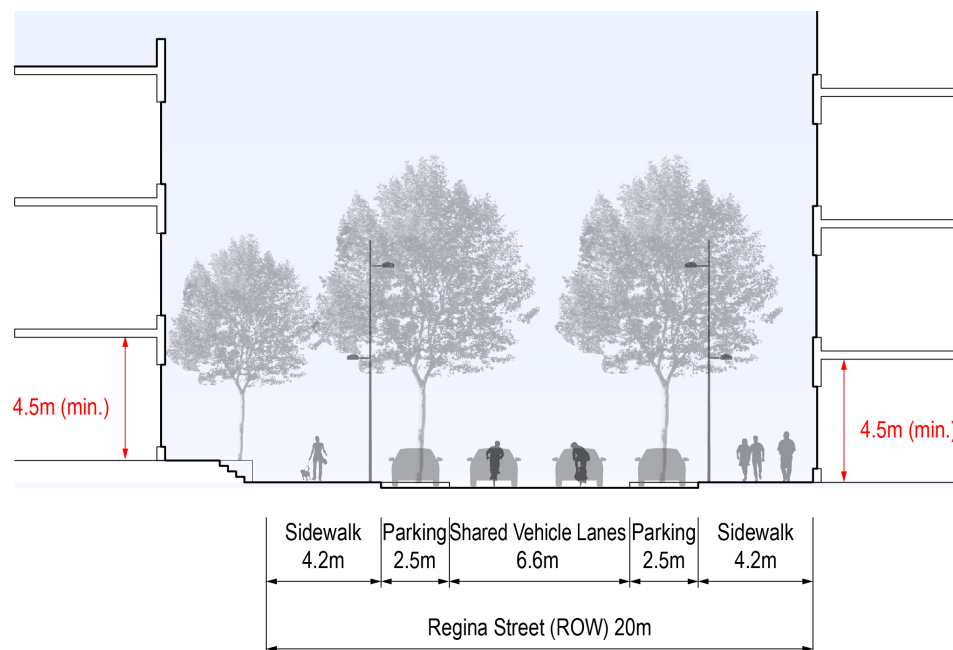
Proposed Cross-section for Regina Street South Between Erb Street and William Street
